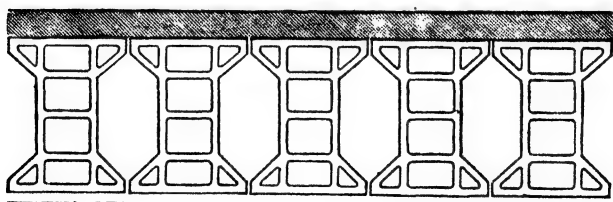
Terra-Cotta Floor: Part Cross-Section (End Construction Recessed).
